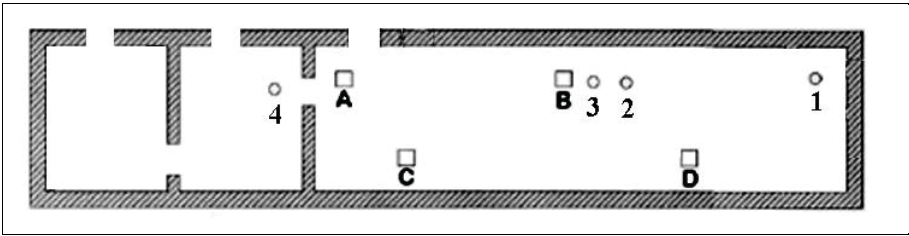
Schematic floor plan of the morgue of Crematorium I (original situation) with surgery room (left) and washing room (with opening no. 4). A,B,C,D: location of current openings in the roof made after the war. 1, 2, 3, and 4: location of original openings of the air raid shelter for ventilation and heating ducts, today closed.¹⁸⁰
